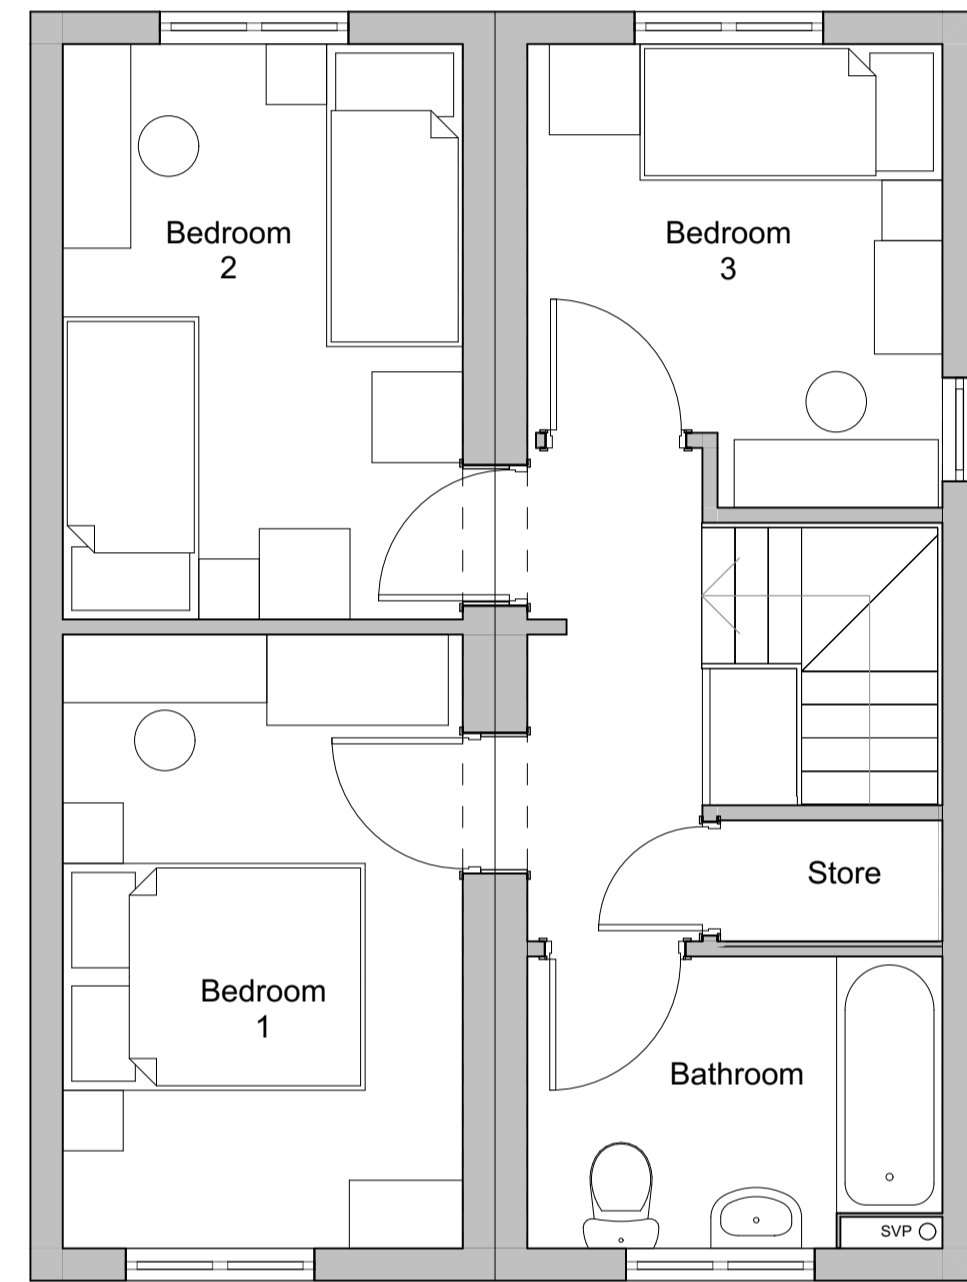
Drawing Title Site 229 Dillotford Avenue 4B Housetype
